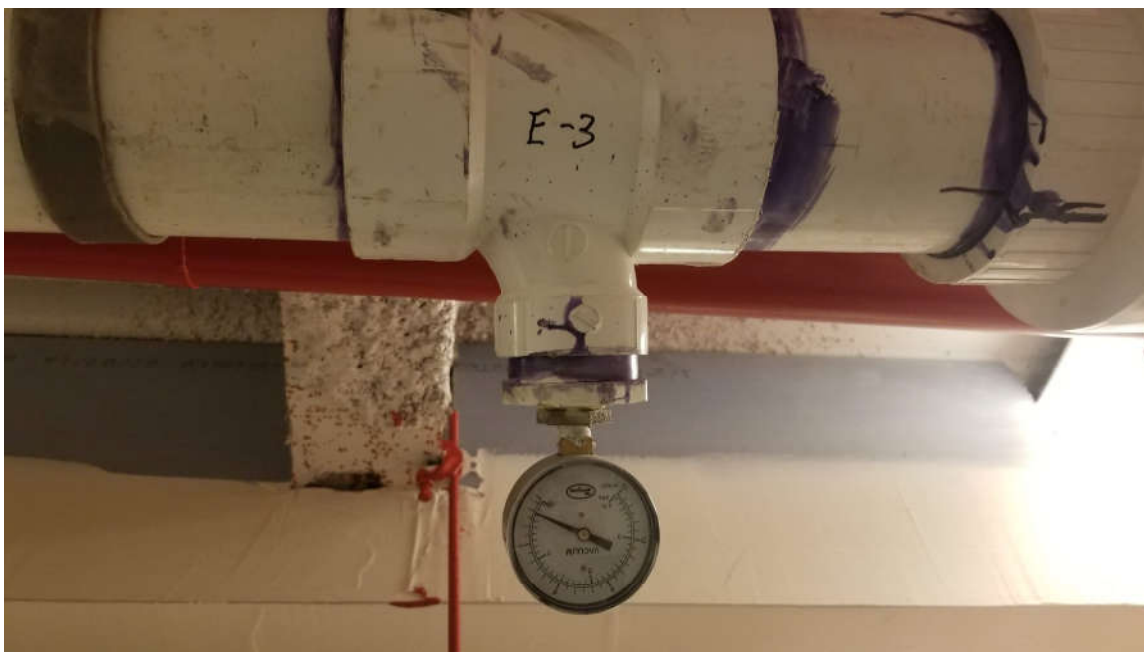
SSDS air conveyance piping and vacuum gauge at riser E3.
